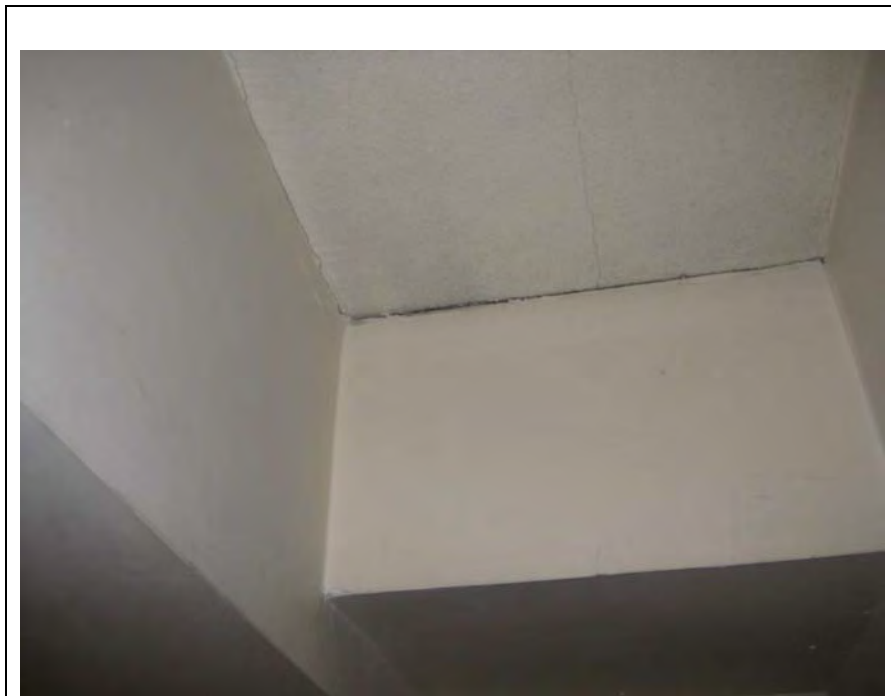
Gap between drywall and floor/ceiling assembly at second floor
